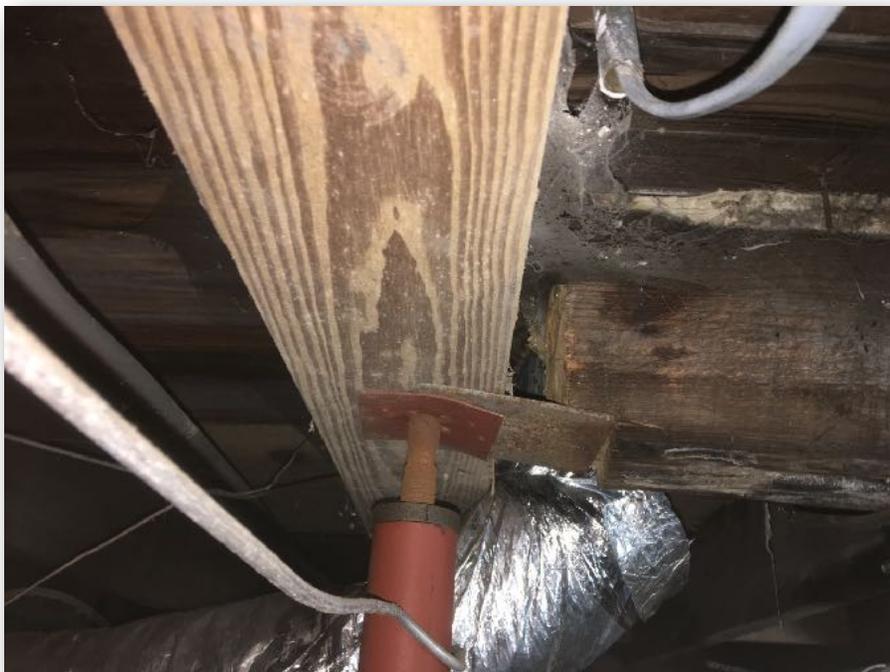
Extensive termite damage along the main center support girder.
